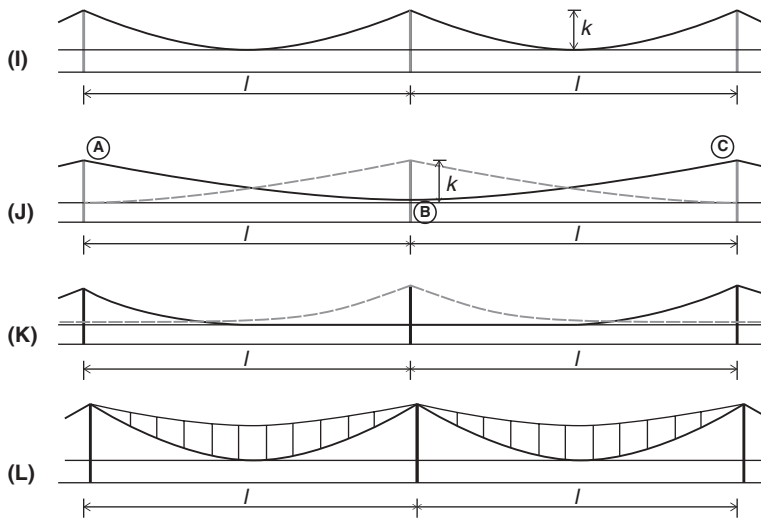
Multi-span suspension bridge with two parabolic main cables in each cable plane
